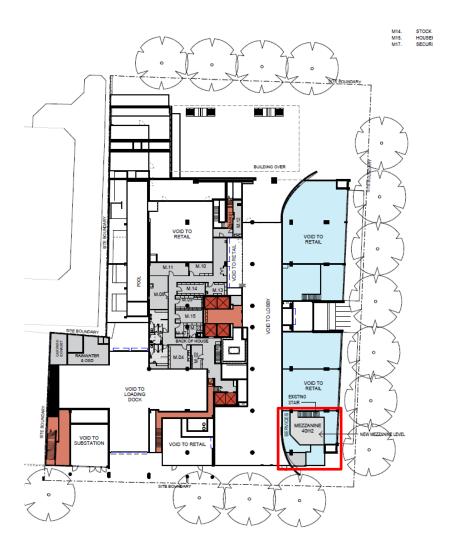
Location of the proposed mezzanine (red rectangle) in the mezzanine floor of the building. Source: Allen Jack+Cottier
